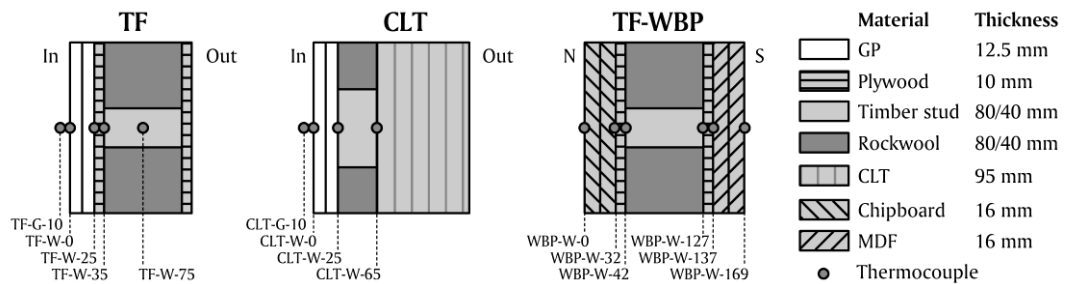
Layout of the timber frame (left), CLT (middle) and wood-based panel protected timber frame (right) wall assemblies and relevant thermocouple positions.
